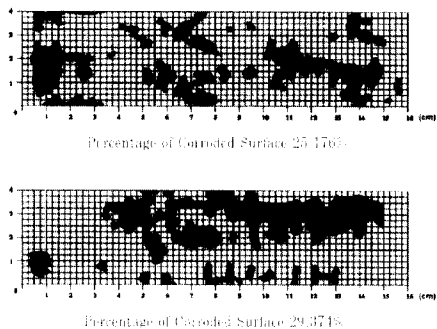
Corroded Surface Area for Reinforcement Steel in Concrete Specimens Labelled in CI/AC5
